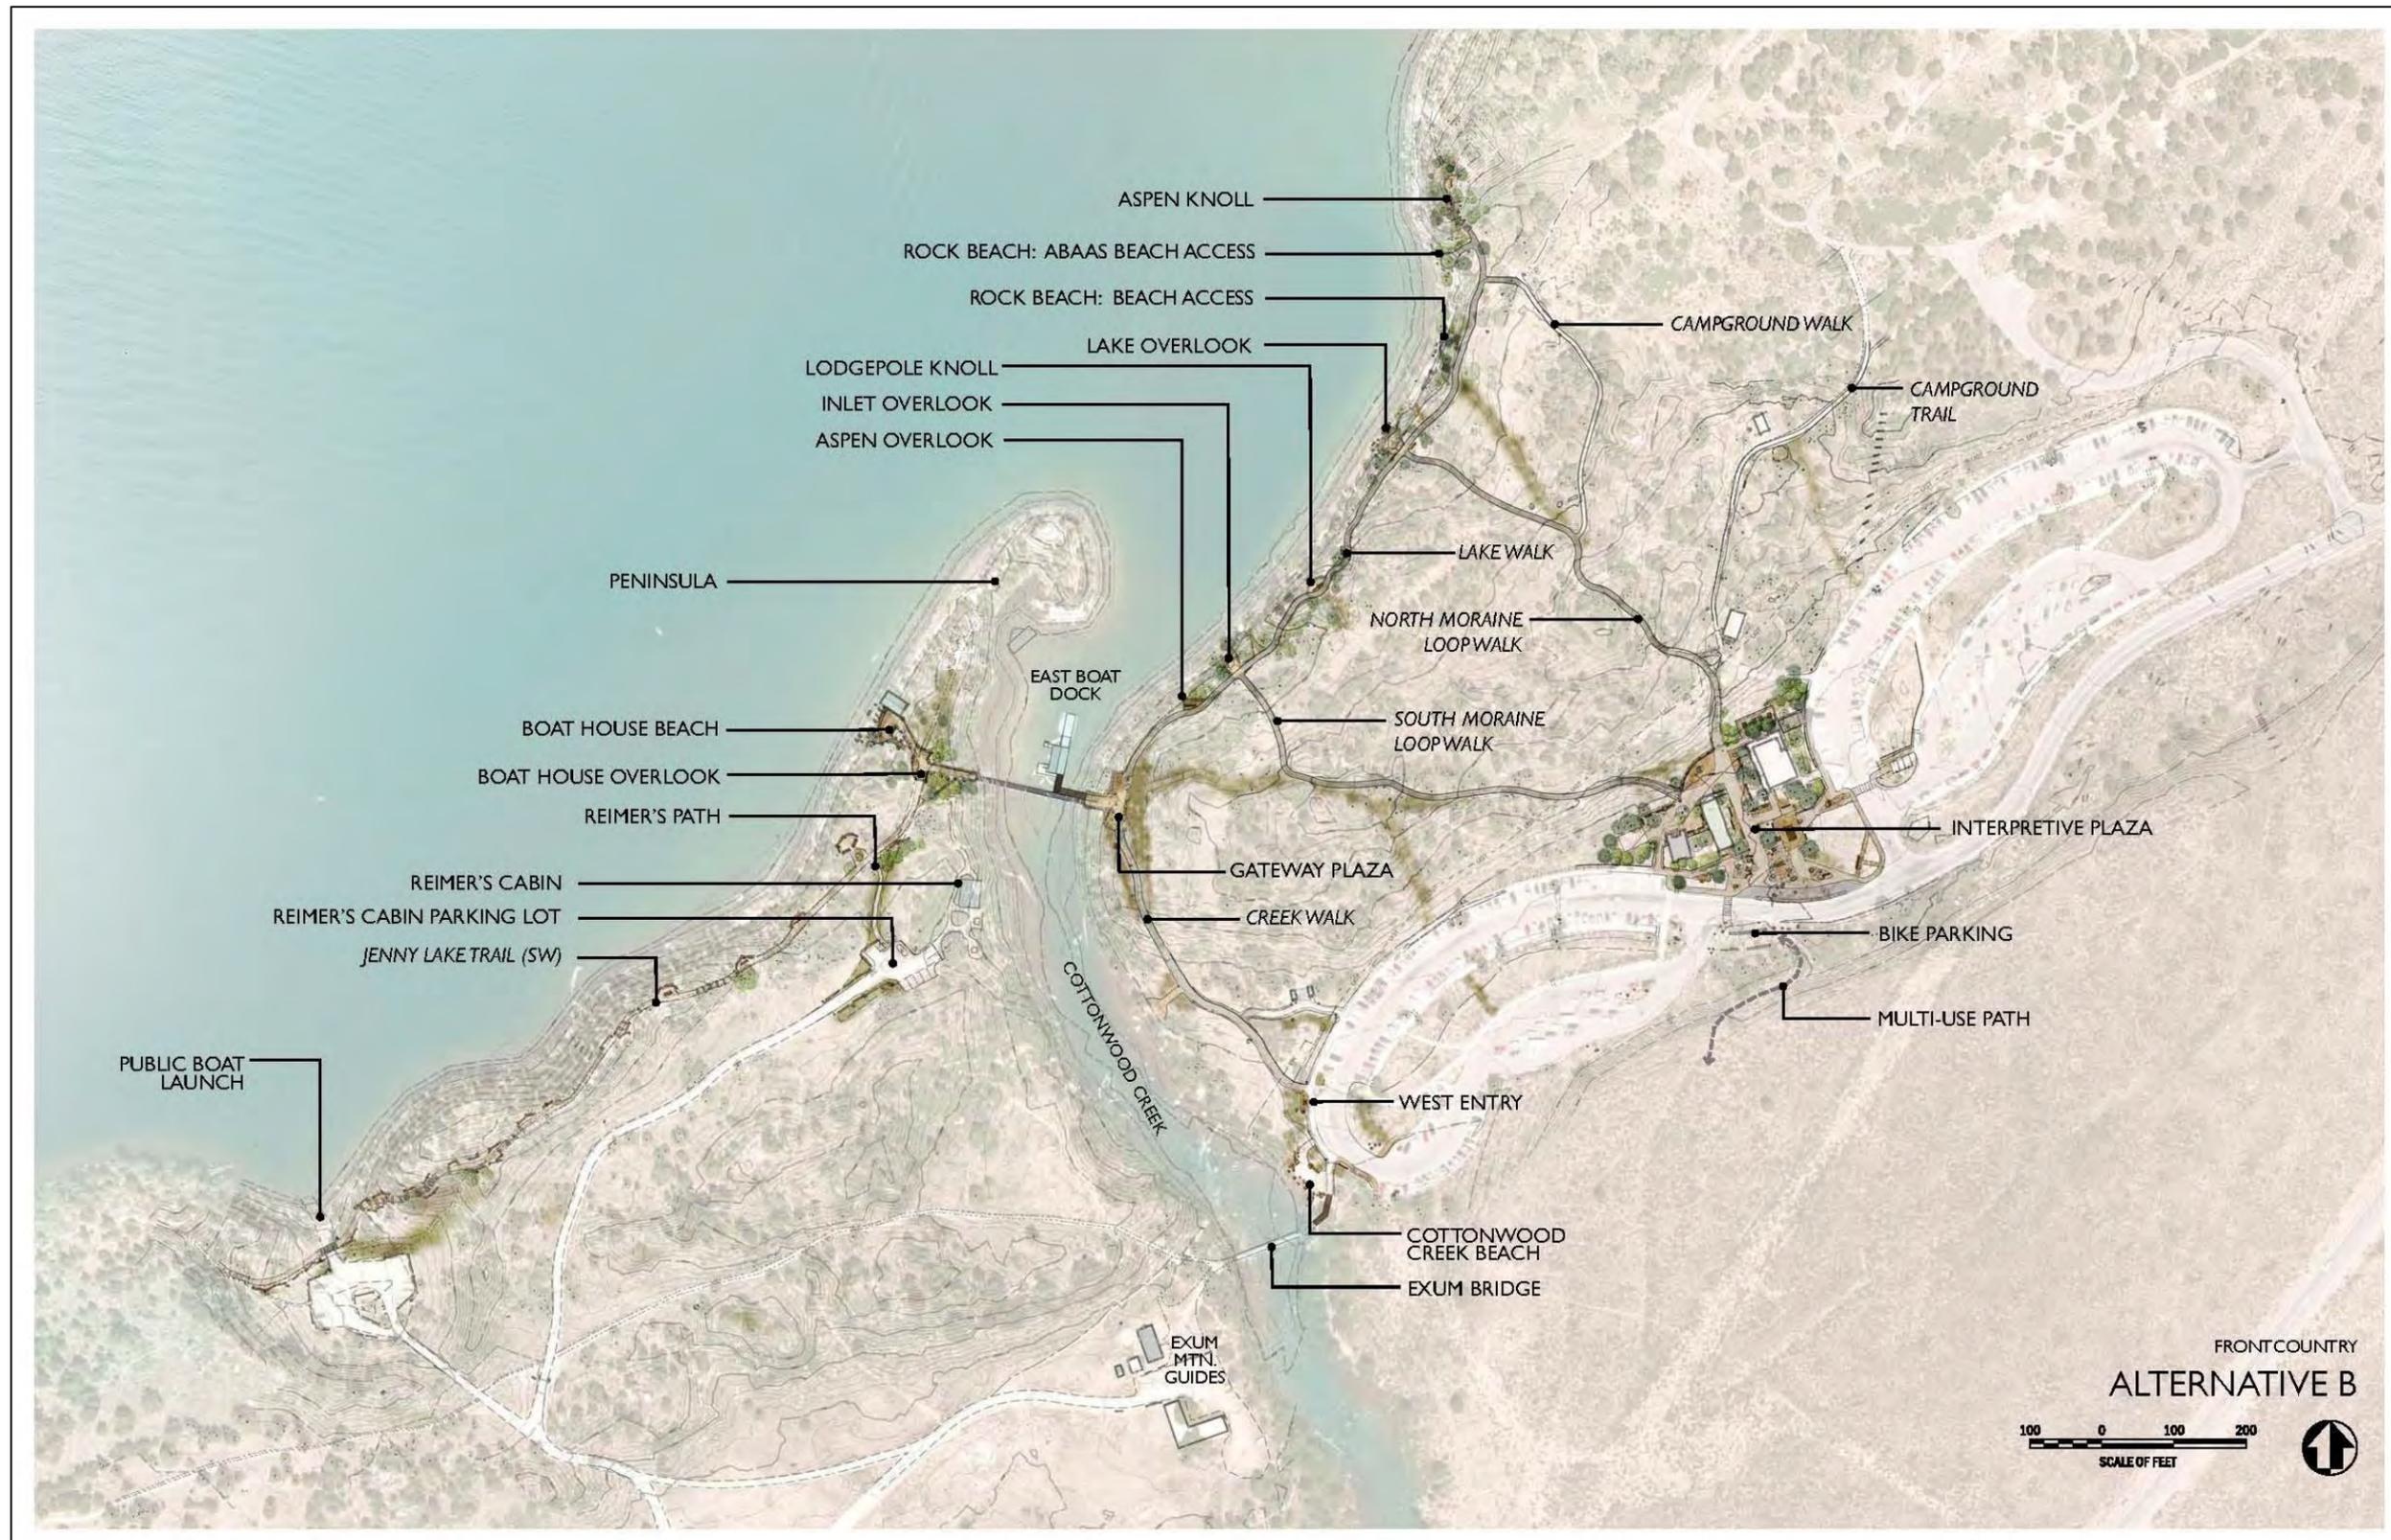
Alternative B, Overall Site Plan, Frontcountry
